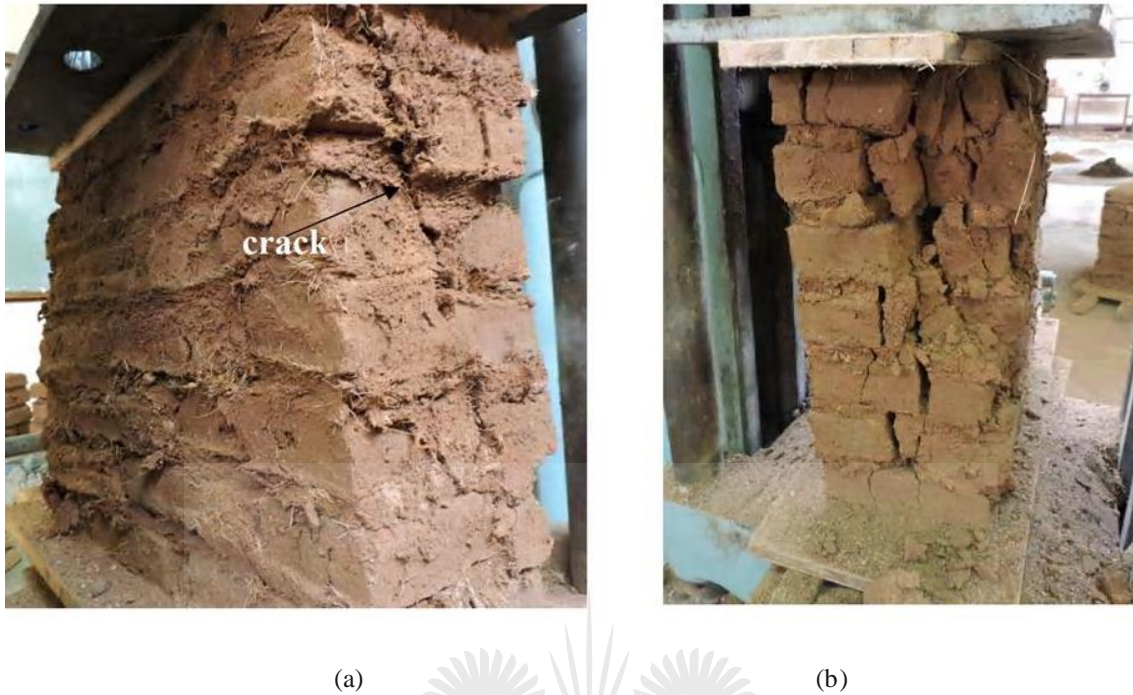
Failure modes of wallets (a) reinforced (b) unreinforced.
